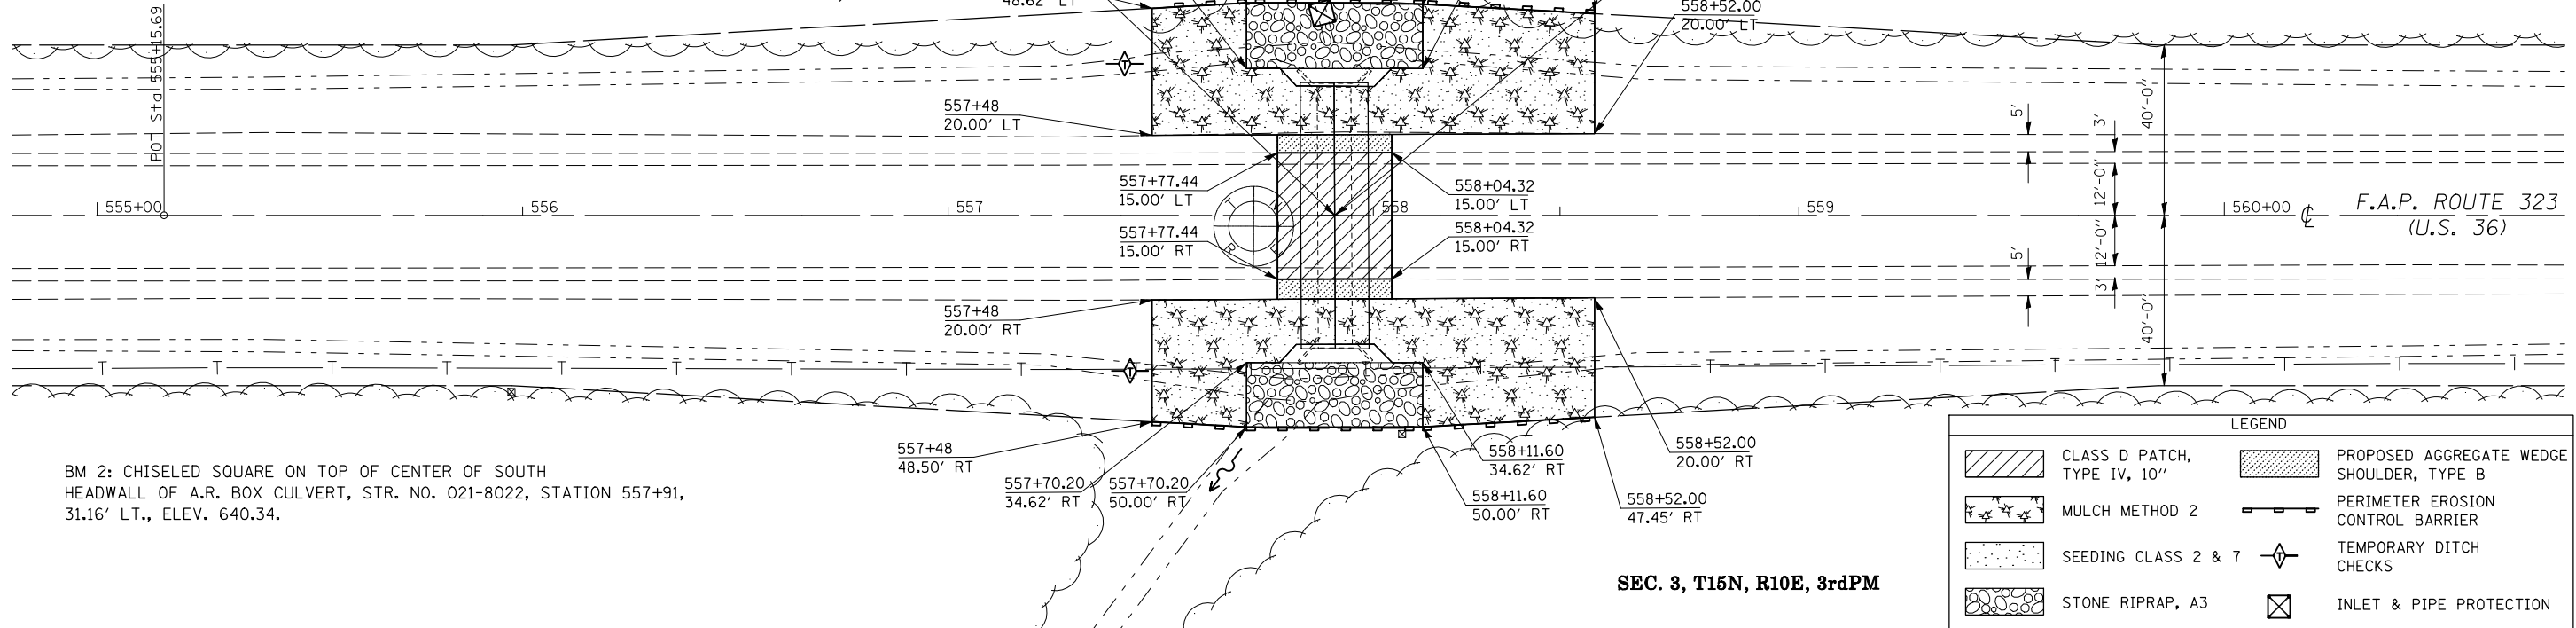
DETAIL OF ACROSS ROAD BOX CULVERT NO. 2
